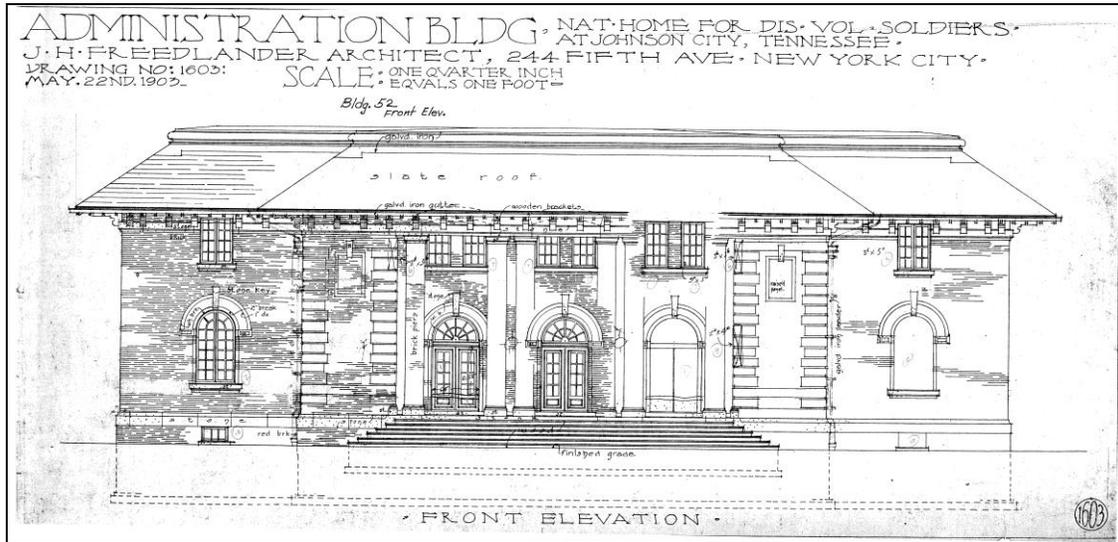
Mountain Branch Administration Building Elevation, (22 May 1903).
